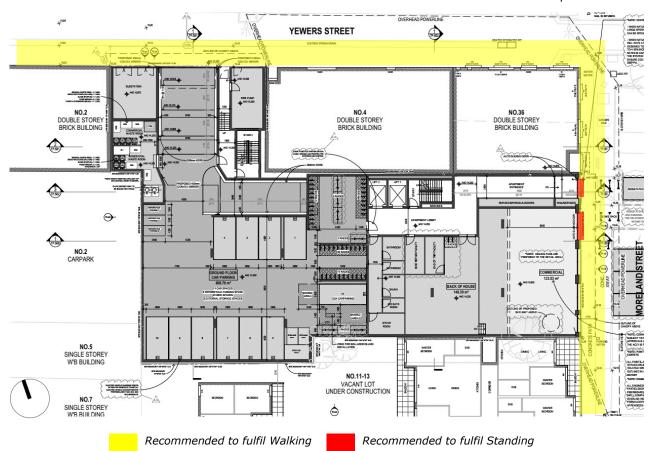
Ground floor plan with recommended wind criteria overlaid.
